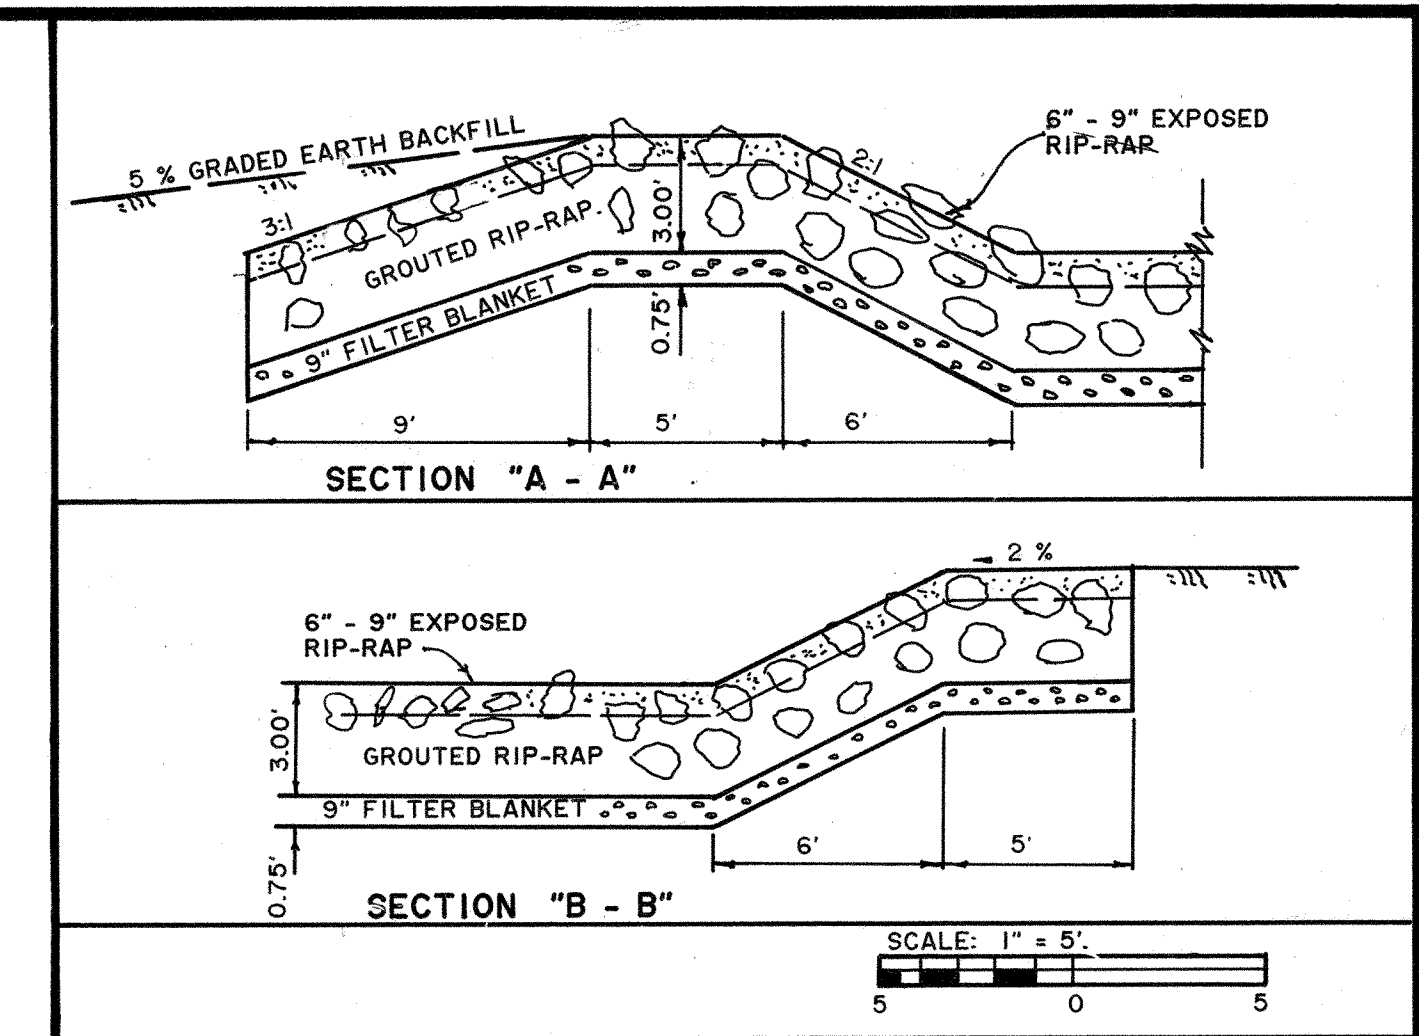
### DETAILS TRANSITION STRUCTURE AND GROUTED RIP-RAP SPILLWAY (THICKNESS = 3 FEET)
